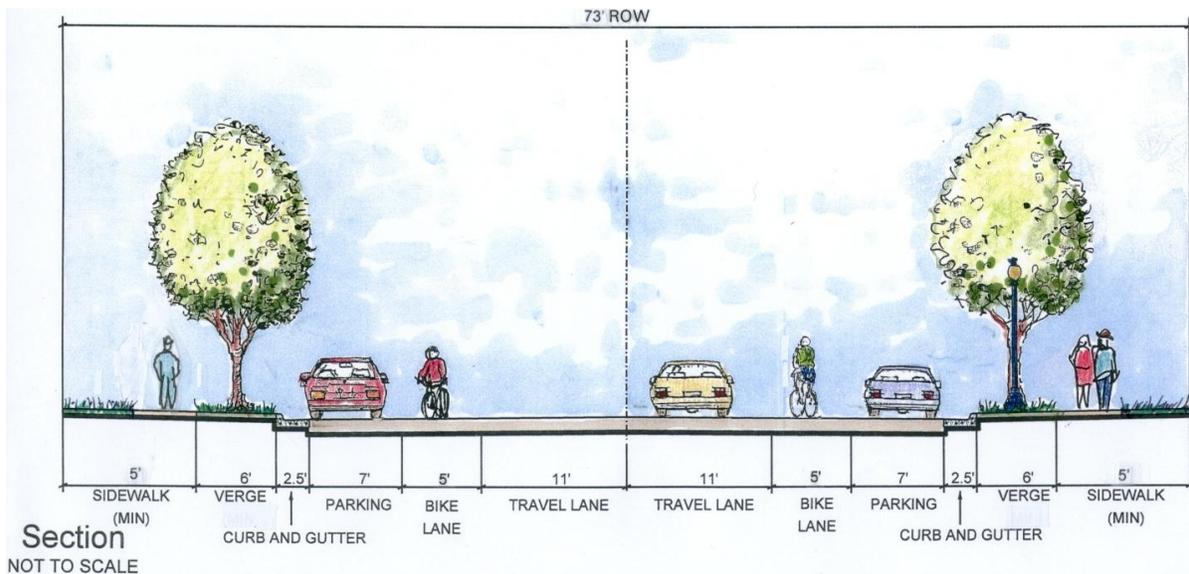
Striped Bike Lanes and Parking Cross-Section
